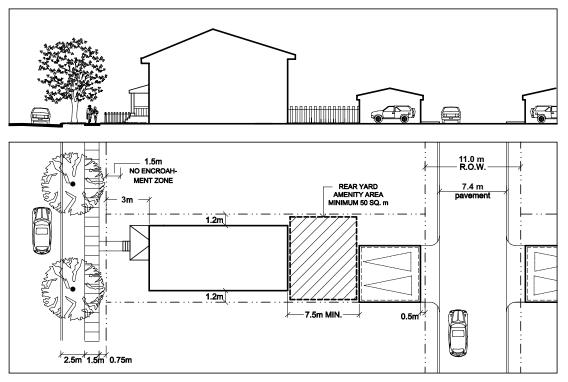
Rear lanes should be considered for specific areas, including housing facing arterial roads (Tremaine, Derry, Louis St. Laurent and Village Squares).
